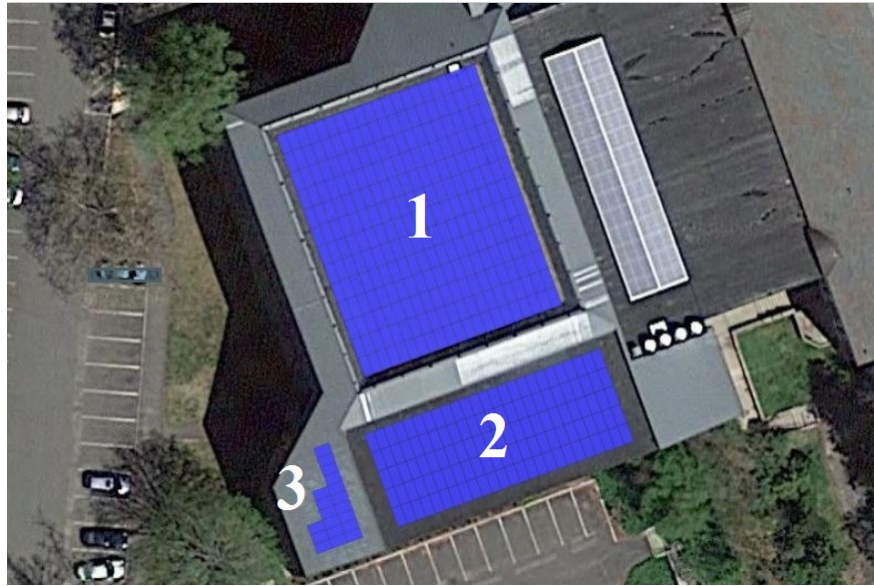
PV system layout on Ainsworth Gym, with array section labeled.
